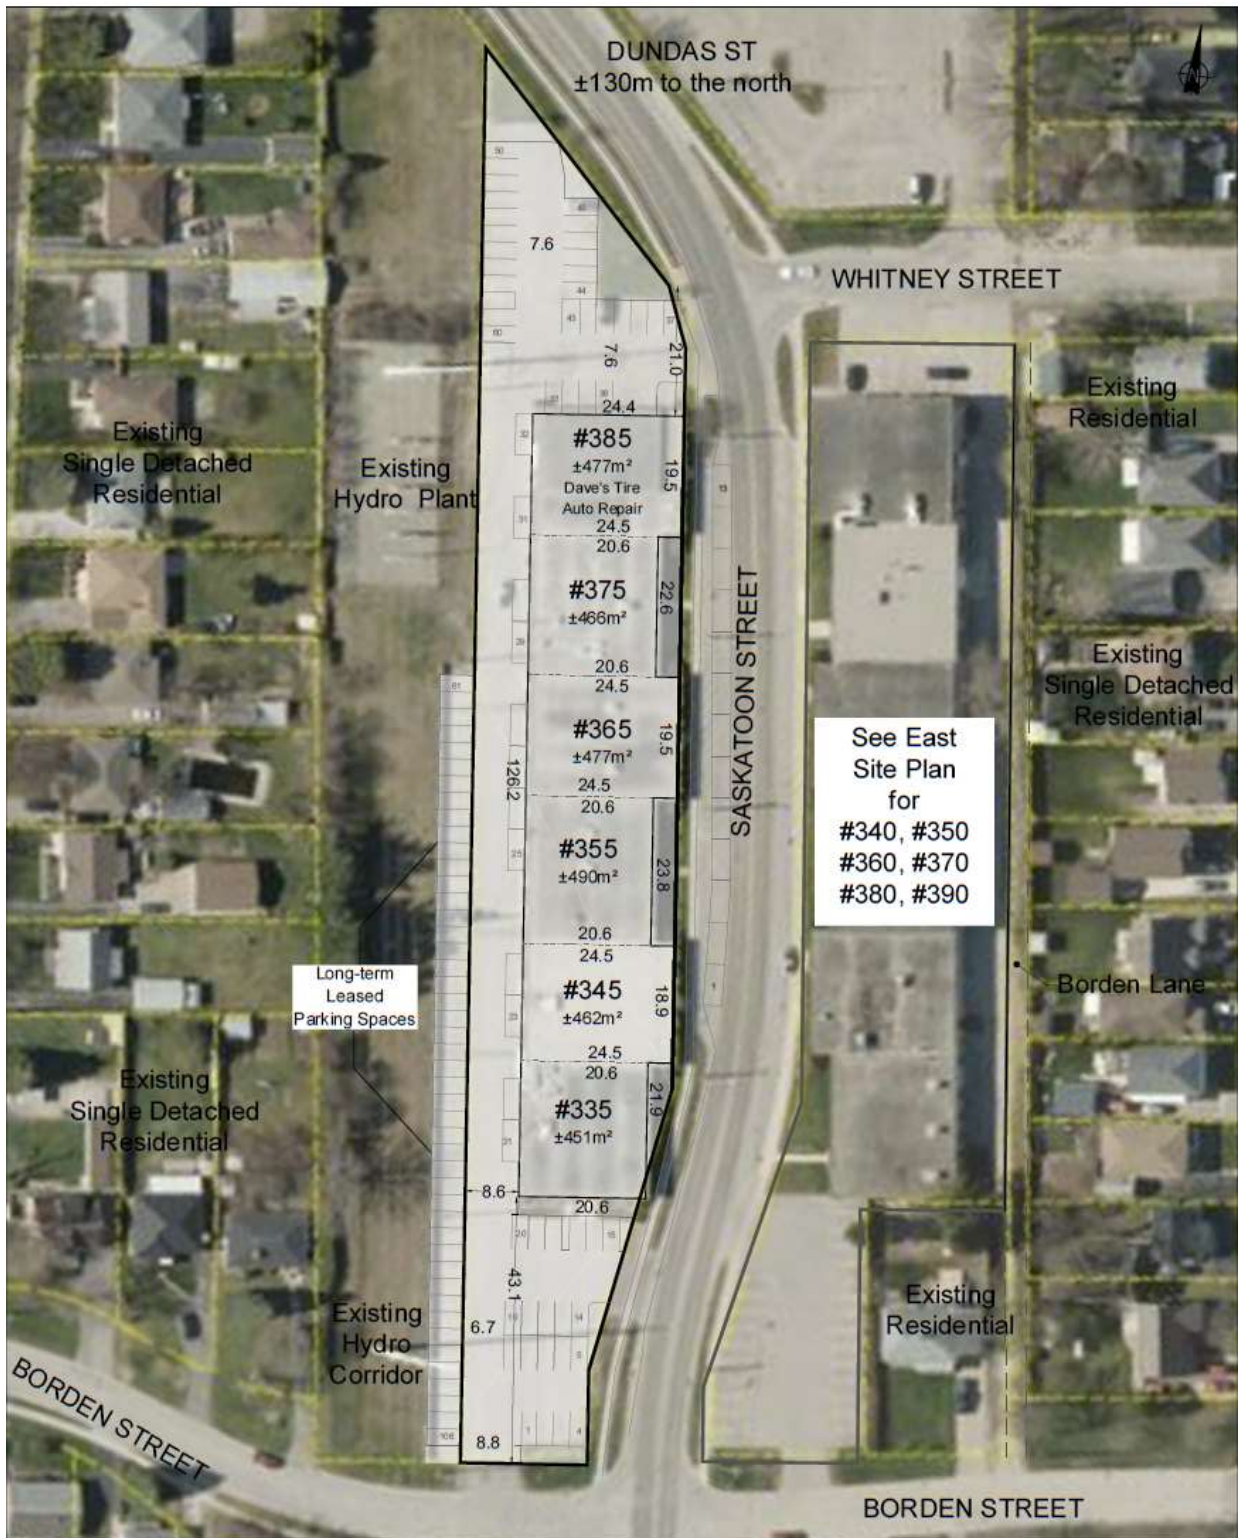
335-385 Saskatoon Street (West Side) – Site Plan Existing Conditions
